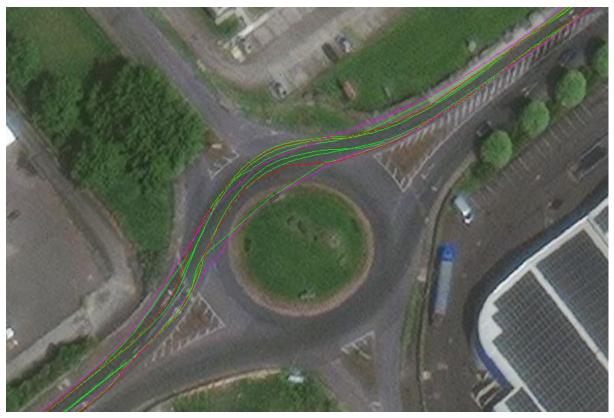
N69 to Northern Dock Road Roundabout - Tower section swept path
